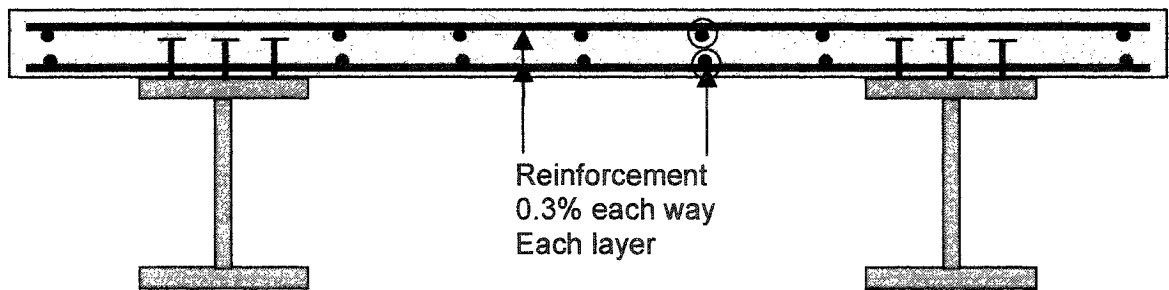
Cross-Section of an Isotropically Reinforced Bridge Deck Slab (OHBDC)
